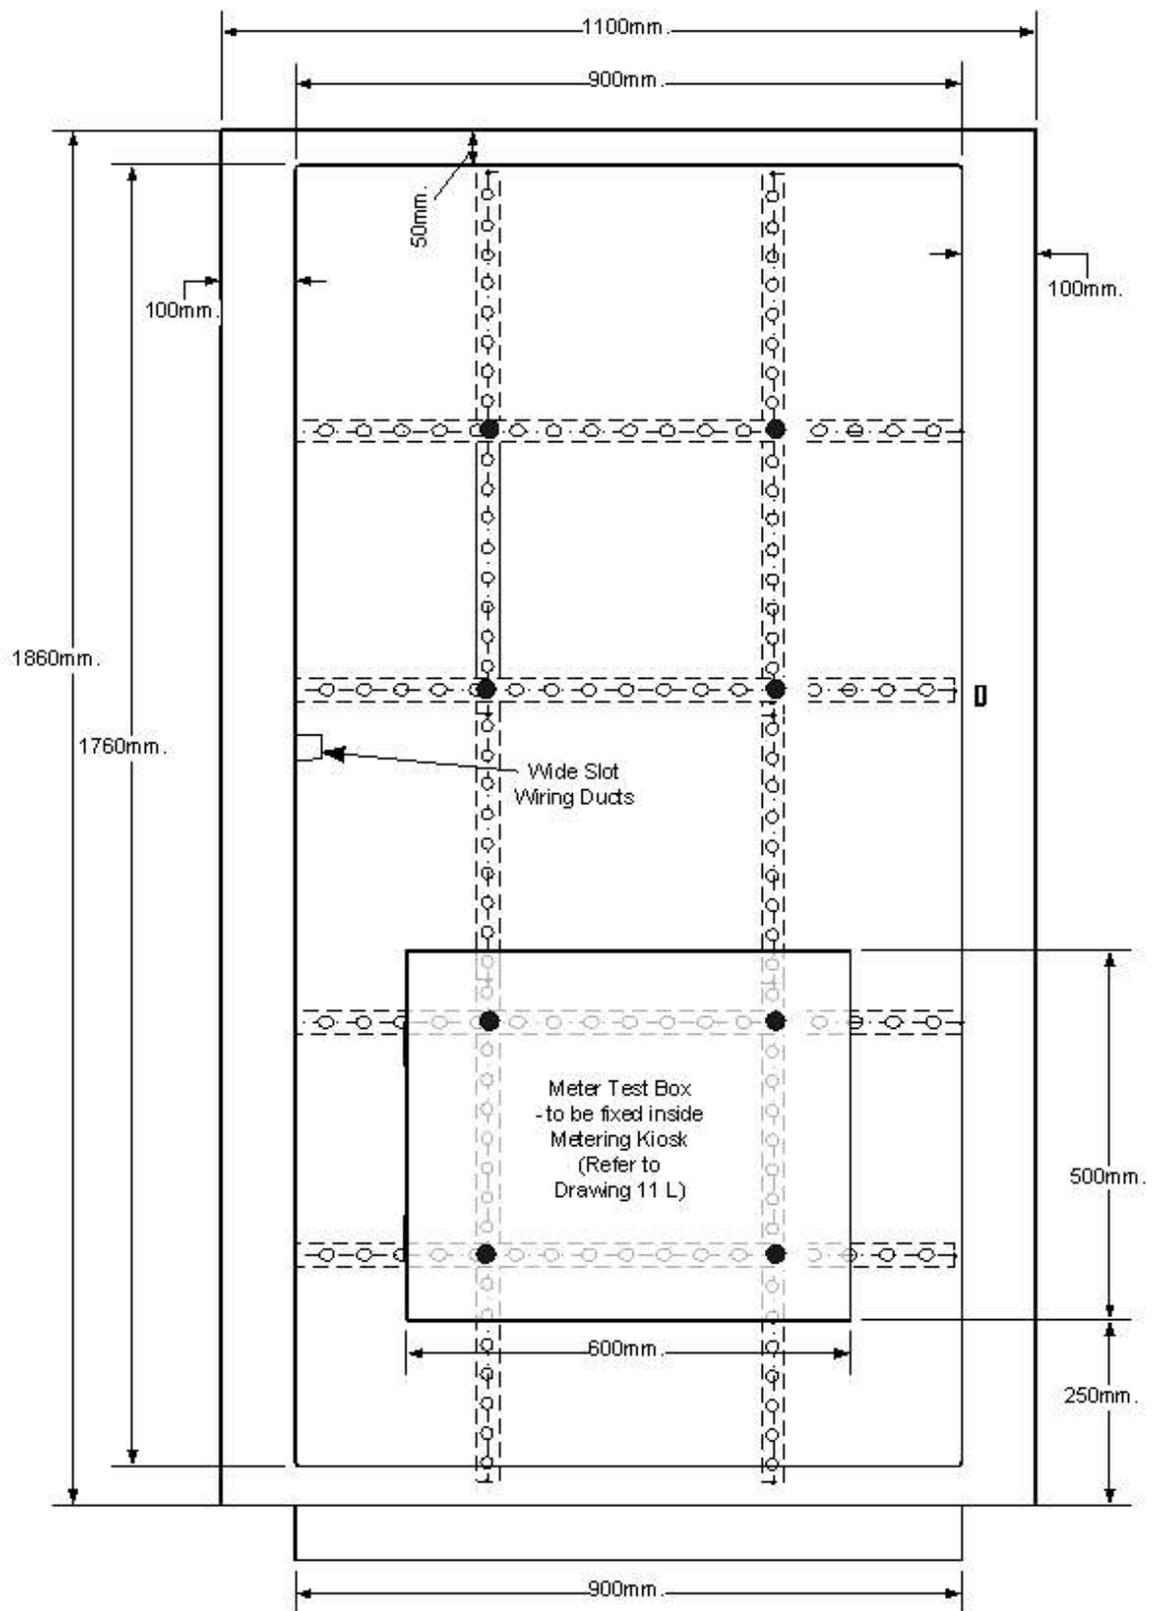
F : MV/HV, 3 FEEDER METERING KIOSK - Front View of External Door
